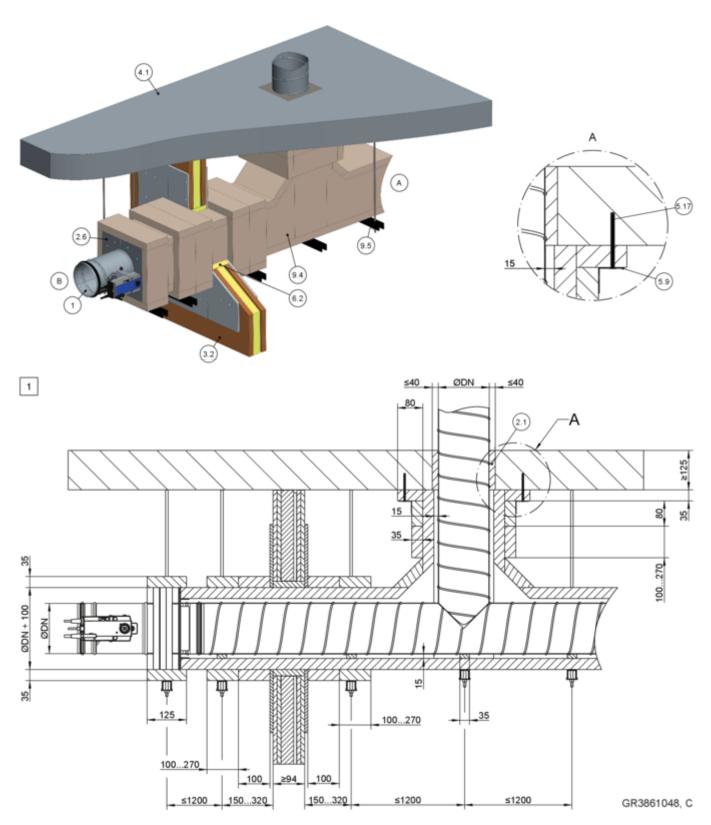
Dry mortarless installation remote from solid ceiling slabs, with installation kit WE2
